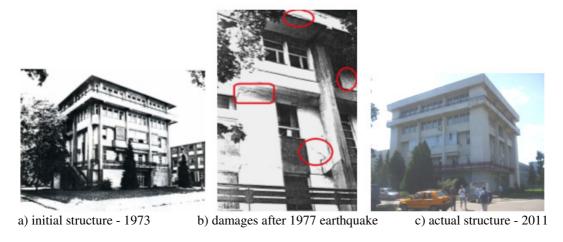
Faculty of Land Reclamation and Environment Engineering building in different stages
